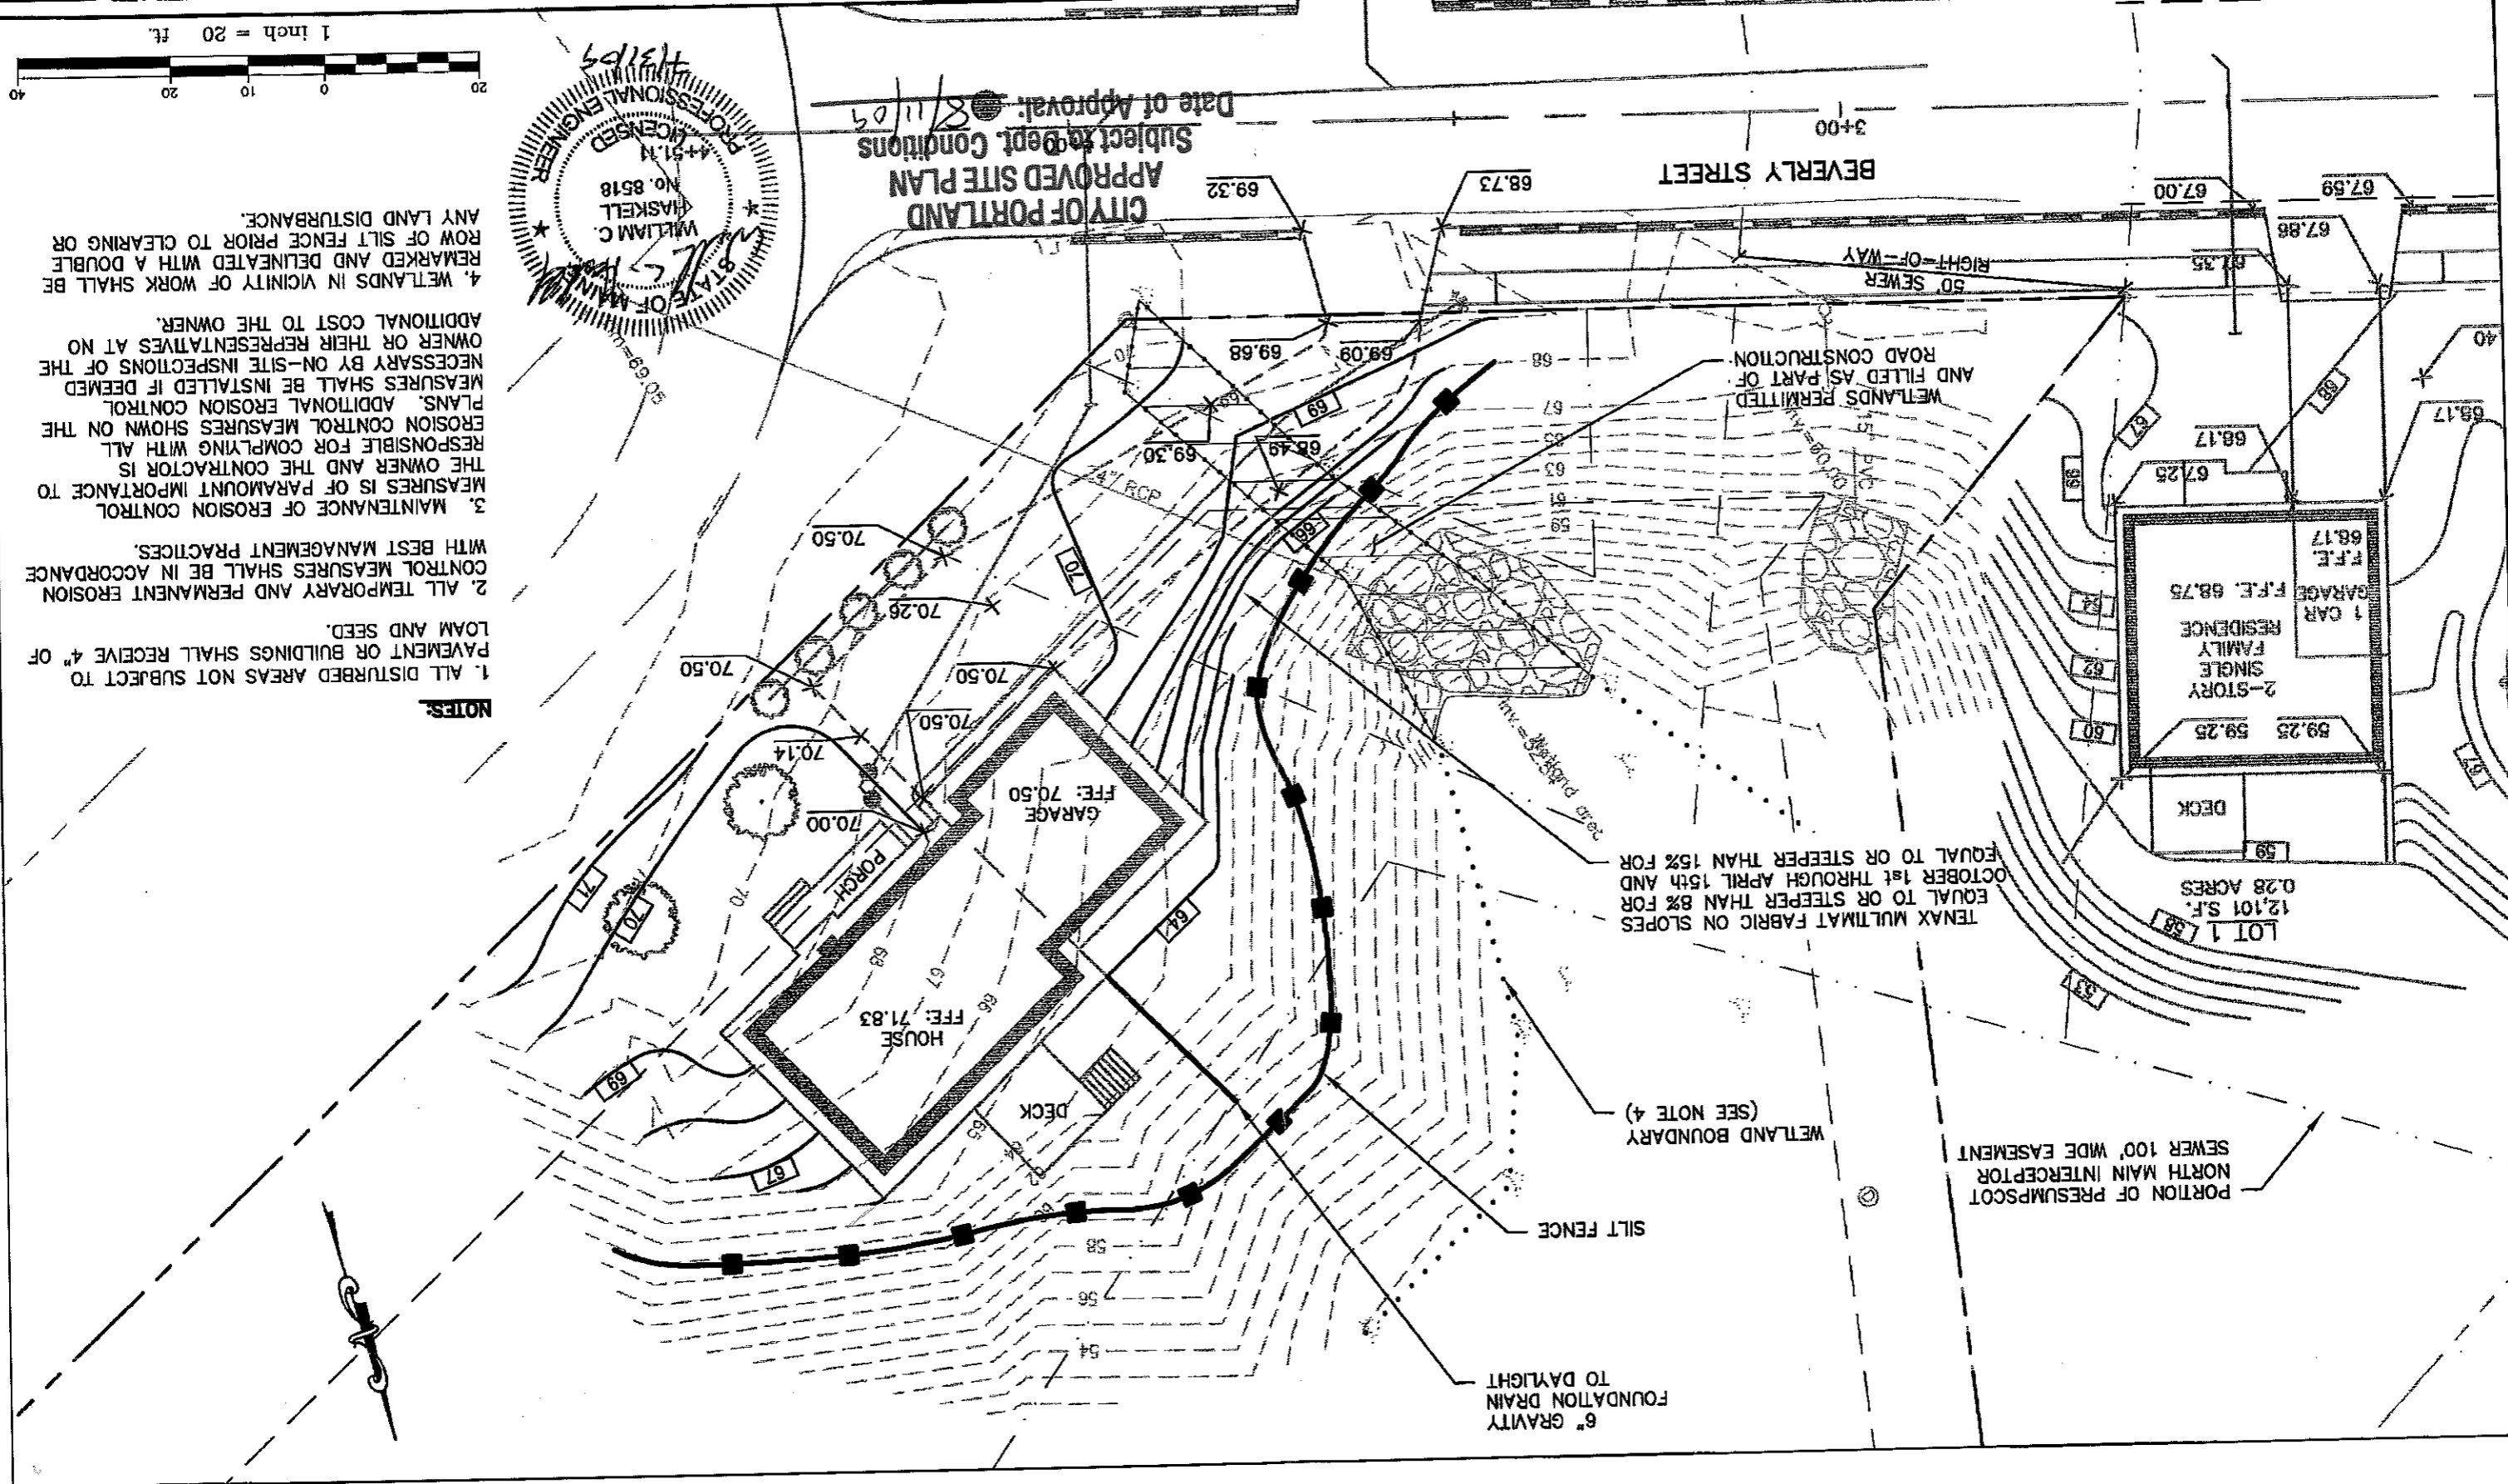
BEVERLY ST. - Grading and Drainage Plan
